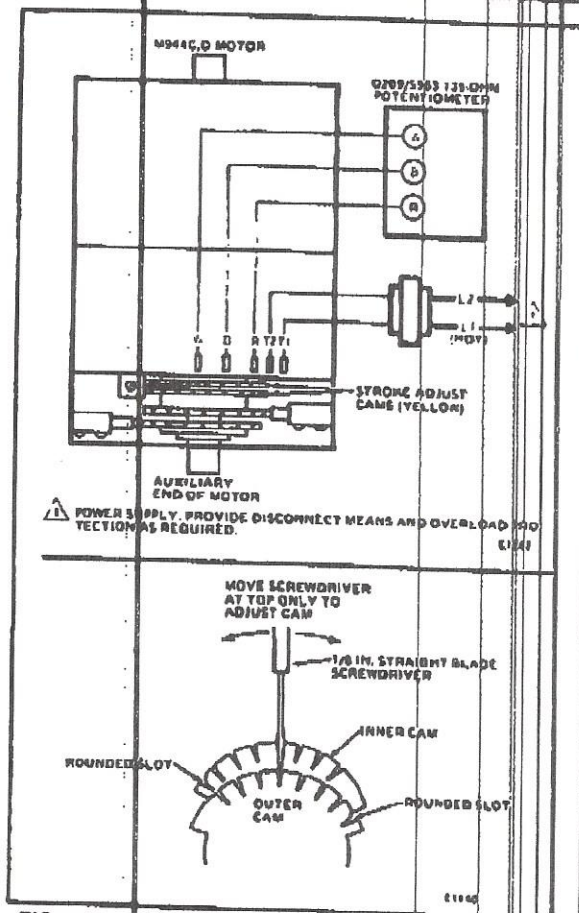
STROKE ADJUSTMENT SETUP—M944C,D.
